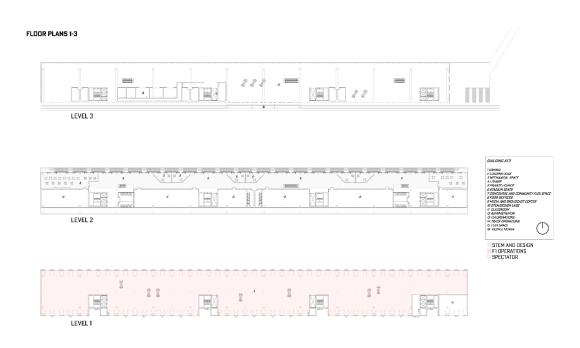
Floor pLans of Levels 1,2, and 3 (Source: Created by Author Nicholas DiBella)
